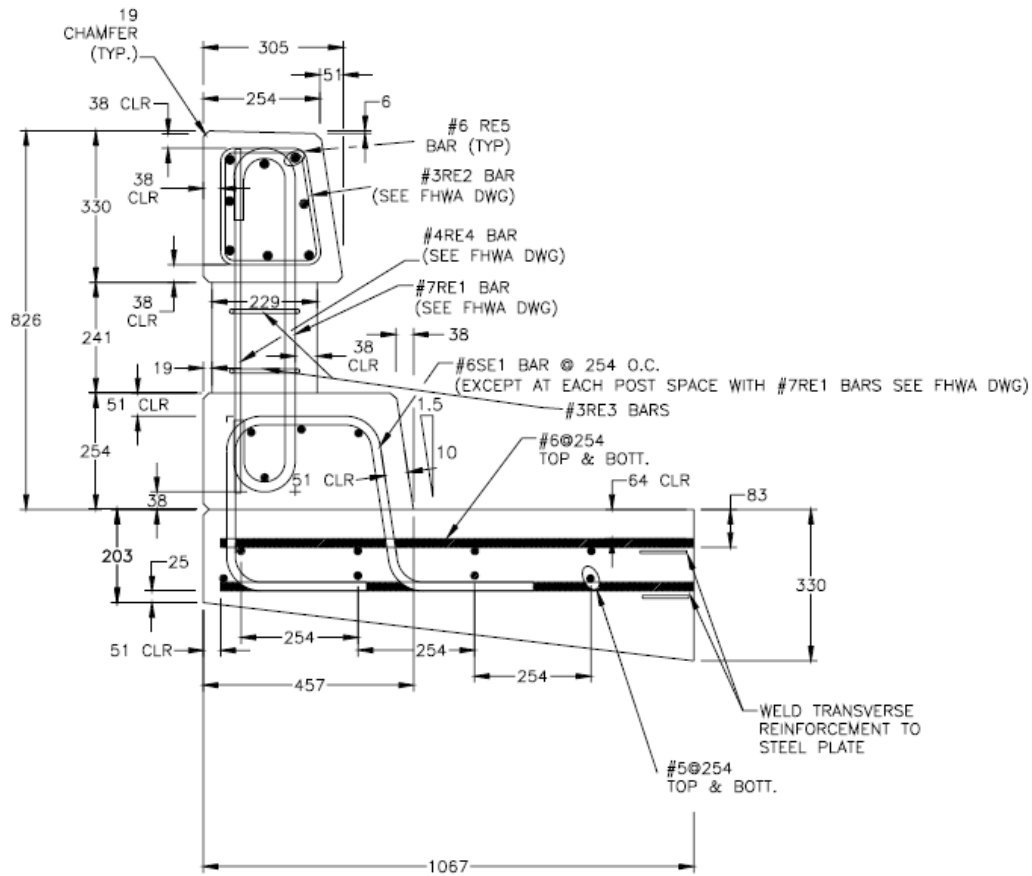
Natchez Trace Bridge Rail Design Details, Test Nos. 405181-11 and 405181-12 (dimensions in mm) [4]
